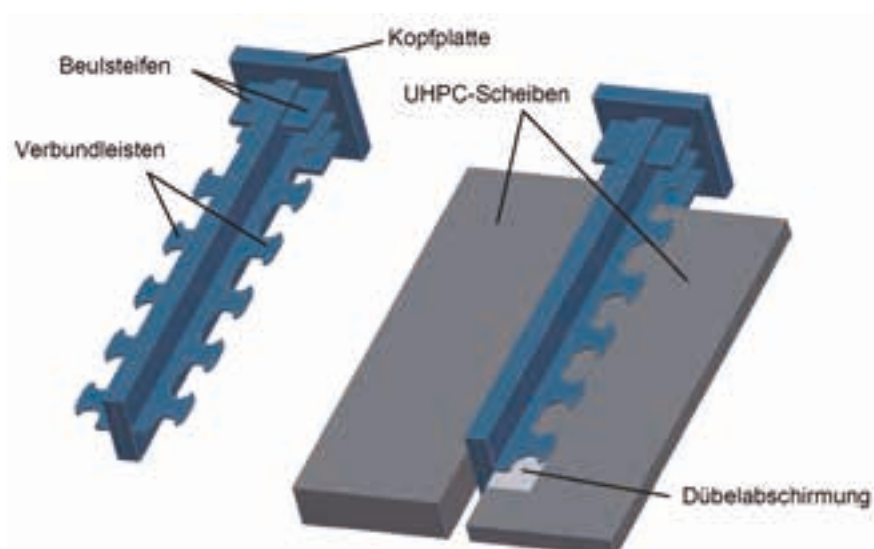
Prefabricated steel element and cutaway push-out test objects to test the load deformation behaviour
